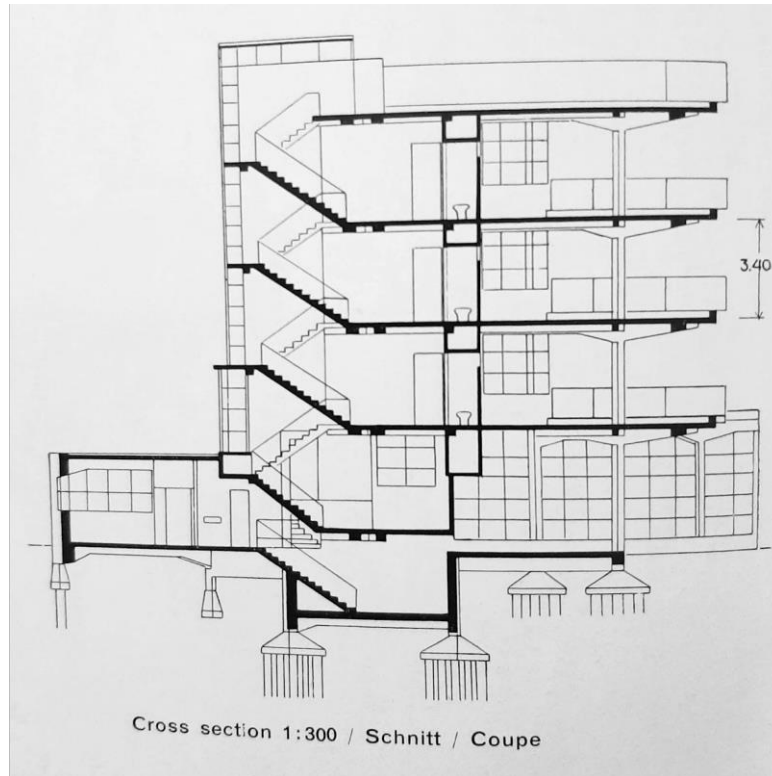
“Open Air School Amsterdam Section” (Roth, 1958)
